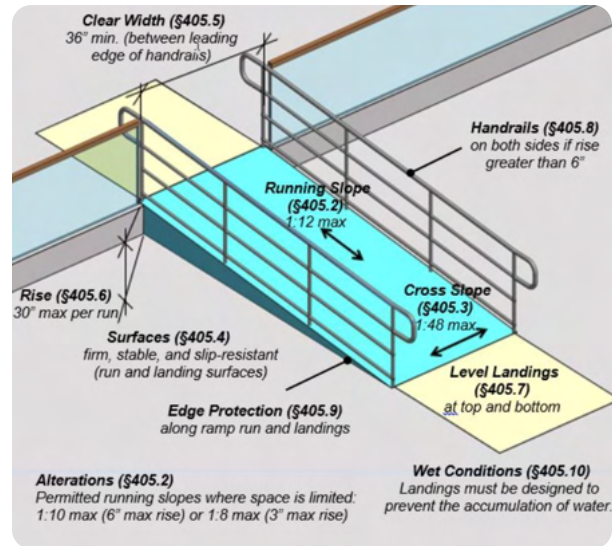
Typical ramp detail. Image courtesy of the U.S. Access Board, 2024.
